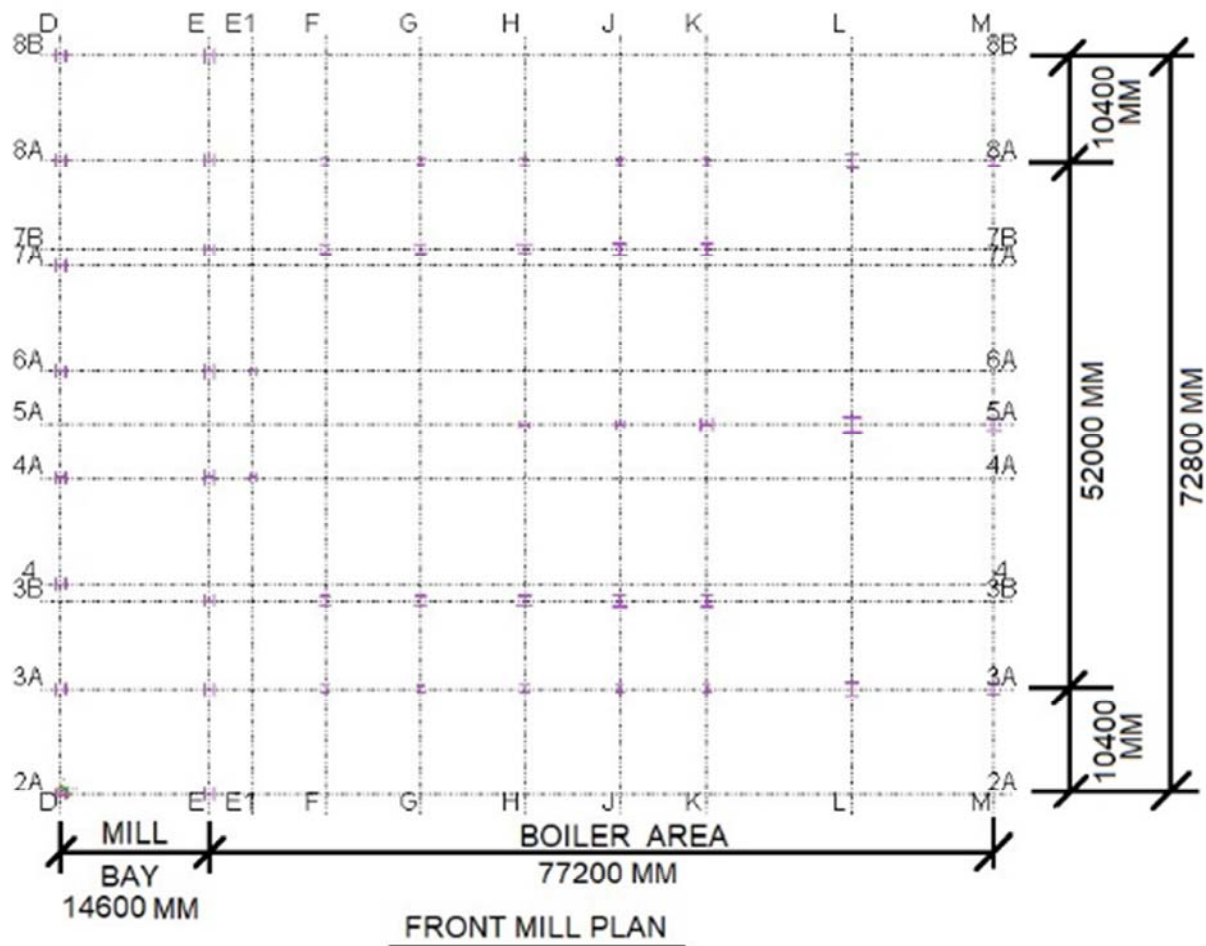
Typical Plan Dimension of Boiler Structure at Base Level.
